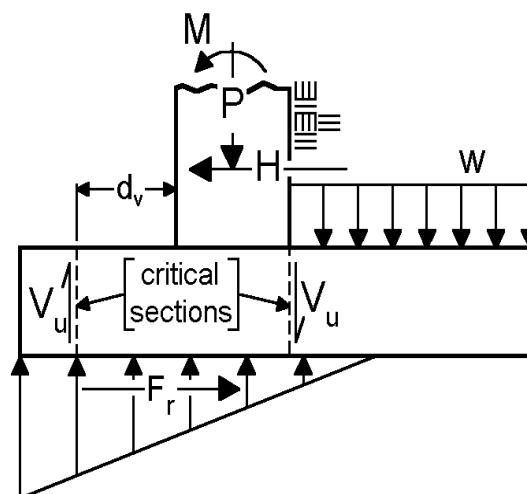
Example of Critical Section for Shear in Footings
